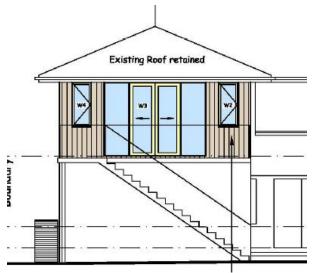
North Eastern Elevation as approved under development consent no. DA2017/1144.
